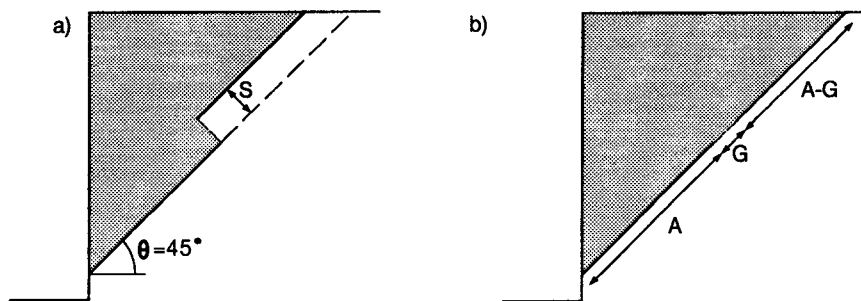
Sliding cases of rock bridge(normal(a) or parallel(b) to sliding plane) system
